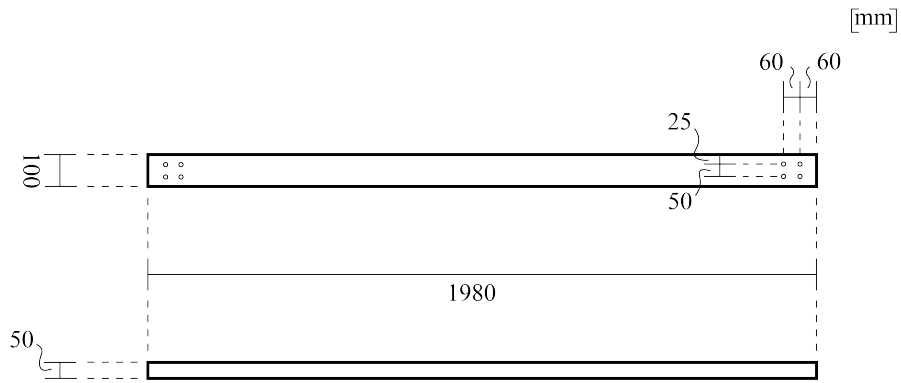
Drawing of a horizontal element in the module with measurements assuming that M16 bolts are used.
